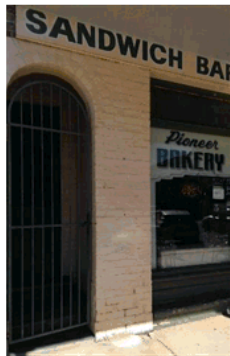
The inside reveal of the entrance pier above the handrail fixing will be sufficiently prominent without detracting from the front elevation.
